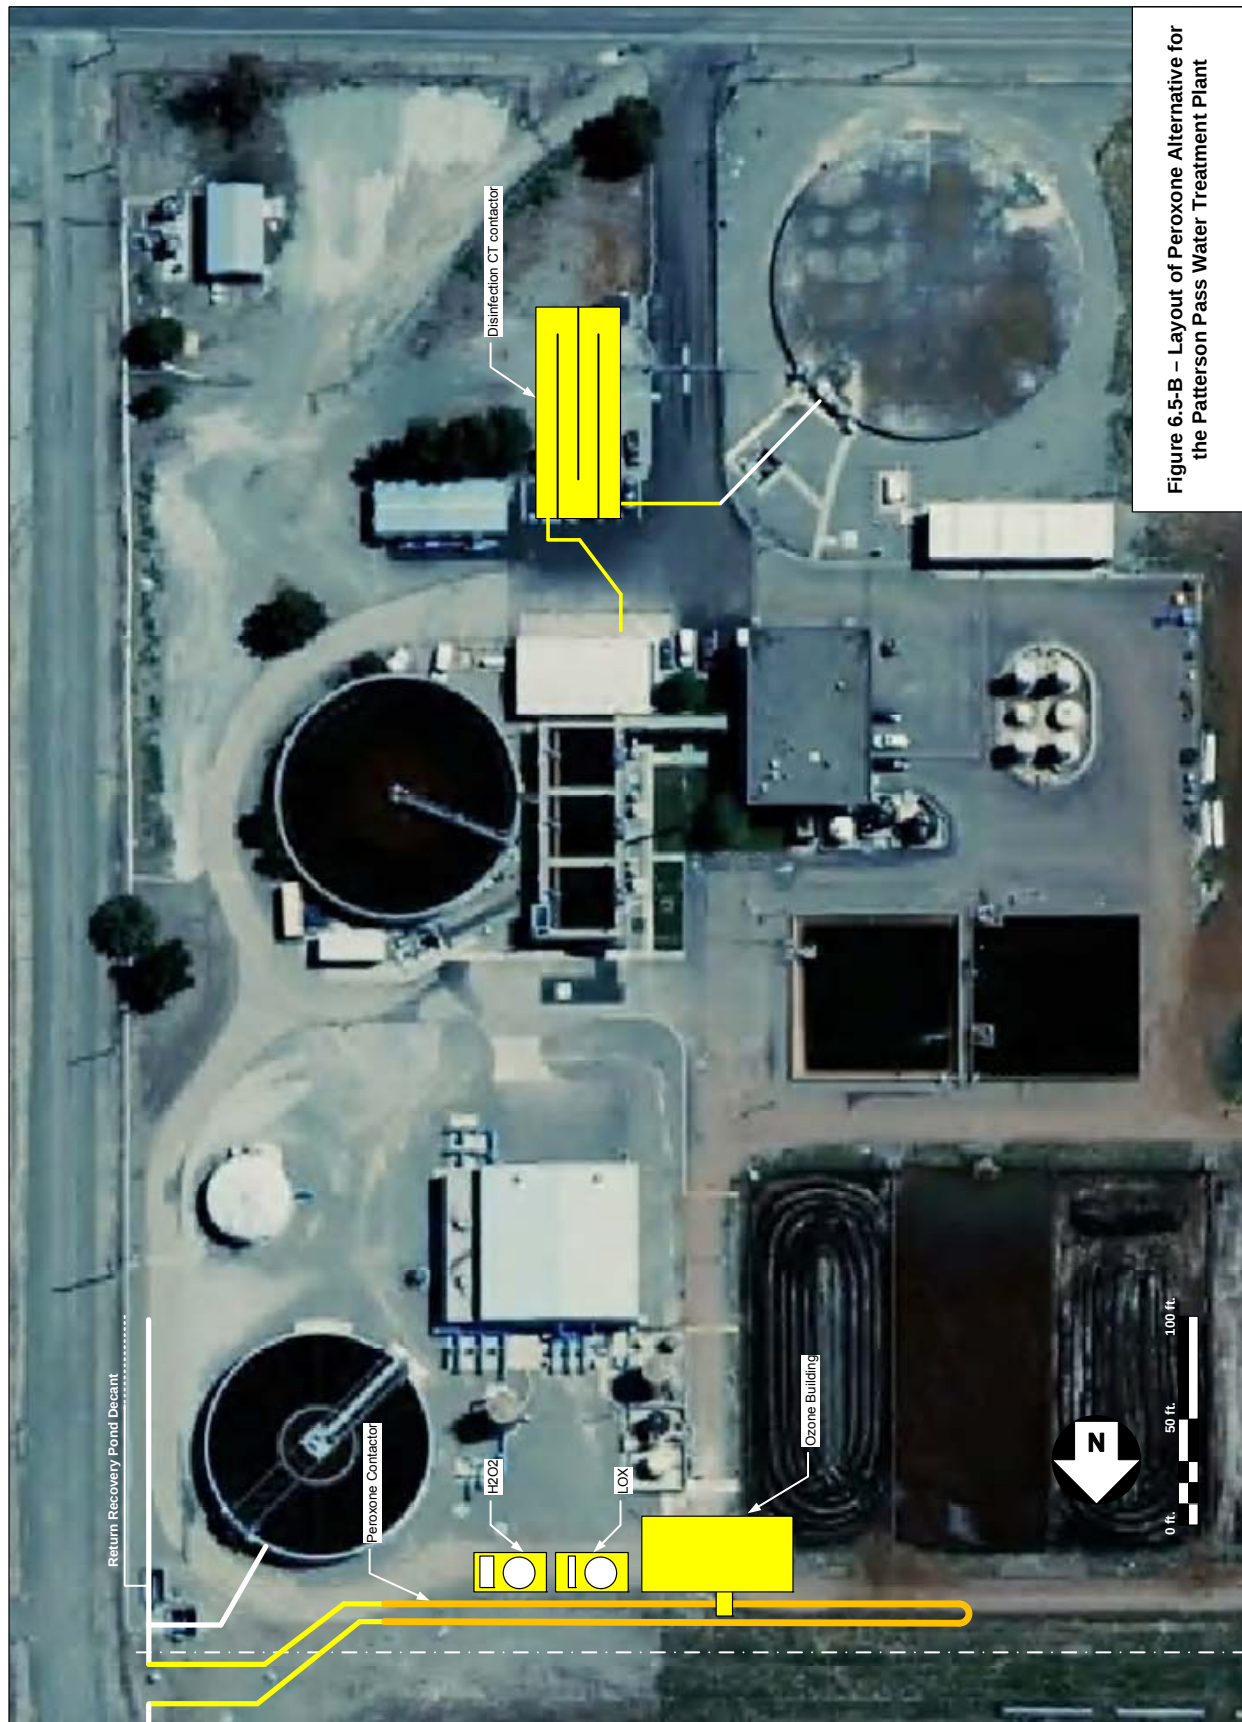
B – Layout of Peroxone Alternative for the Patterson Pass Water Treatment Plant
